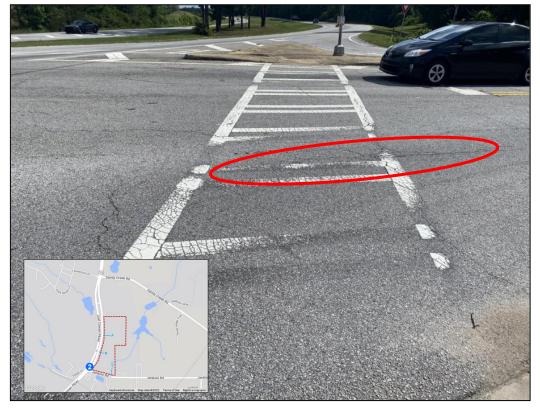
Eastbound/Westbound Jenkins Road Minor Pavement Cracking
